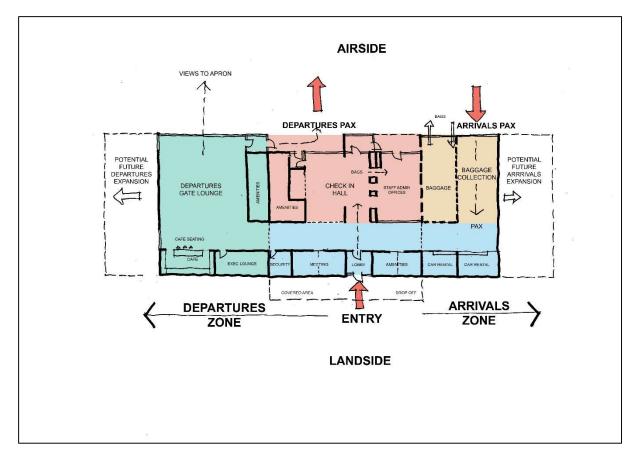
Terminal Building Concept - Indicative Floor Plan (Source: Noxon Giffen Architects)
